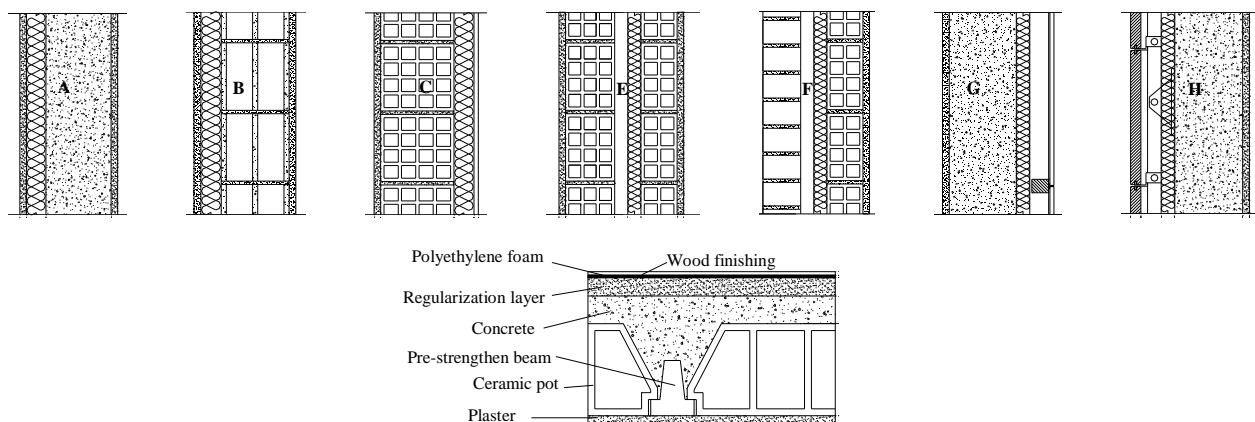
Vertical cross-section of the different walls and for the floor considered on the study
